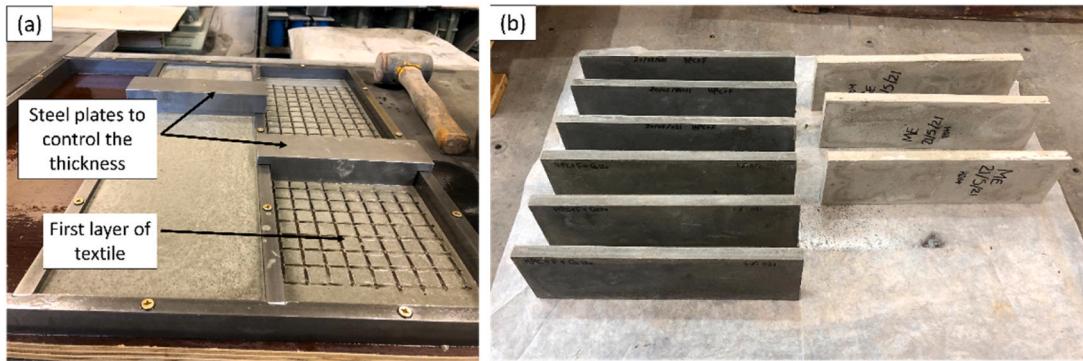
Construction of beams (a) Casting of the beams, (b) Demoulding the beams after casting.
